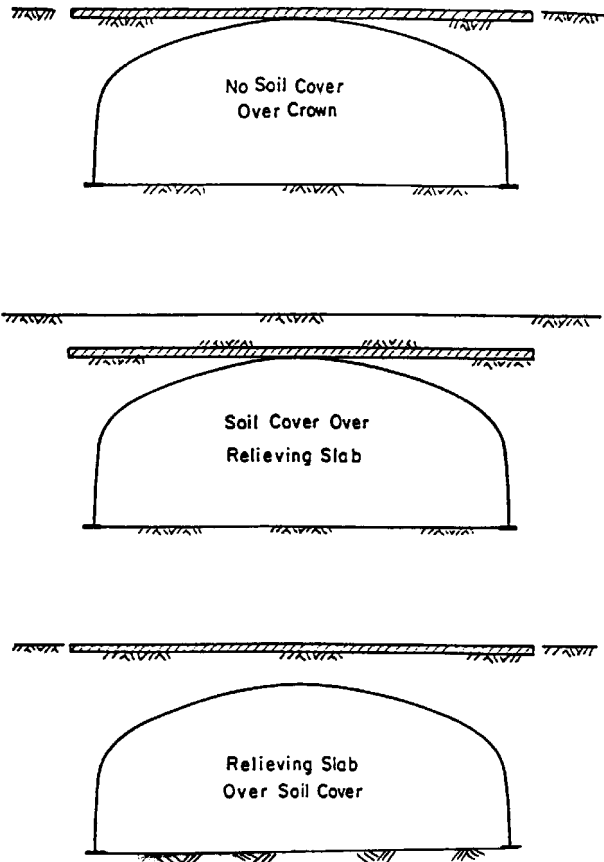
P-1 - Metal Box Culverts with Cement Concrete Relieving Slabs
